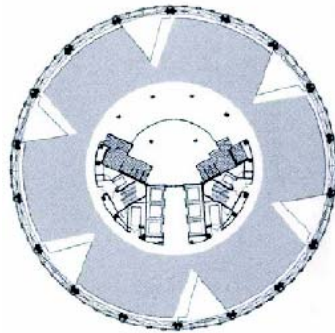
Typical Floor Plan, Swiss Re Building, London (Laitnein, 2001)
